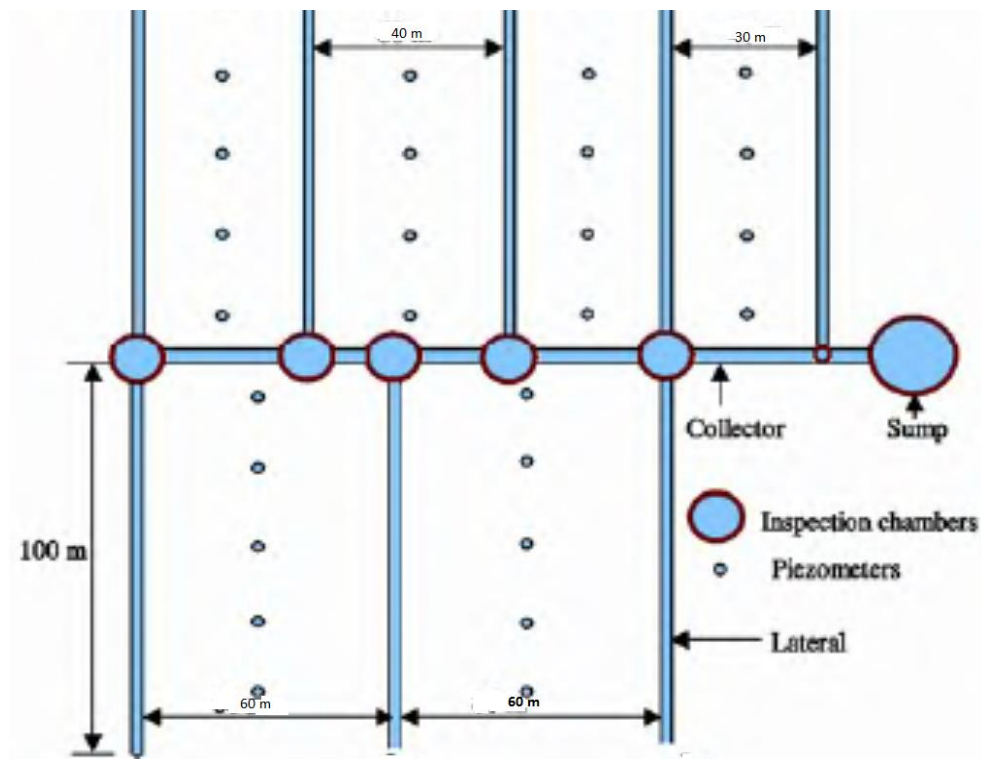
Layout Plan for subsurface drainage system in Gridiron pattern
